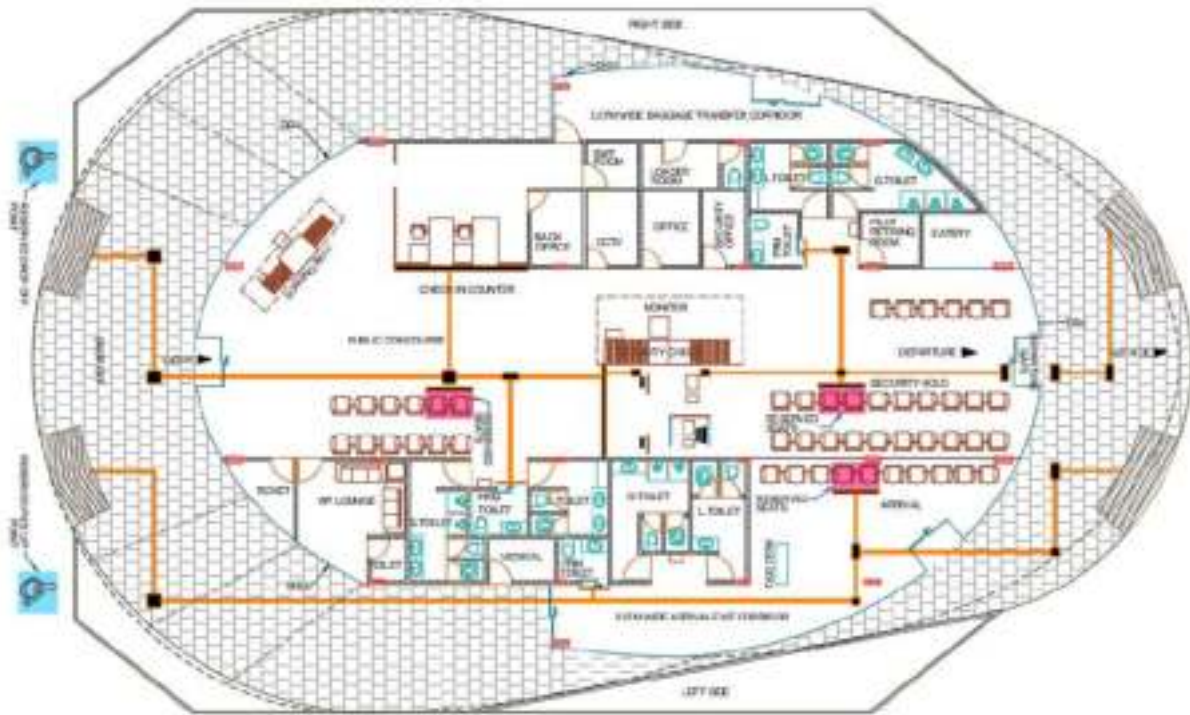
TERMINAL BUILDING LAYOUT PLAN
